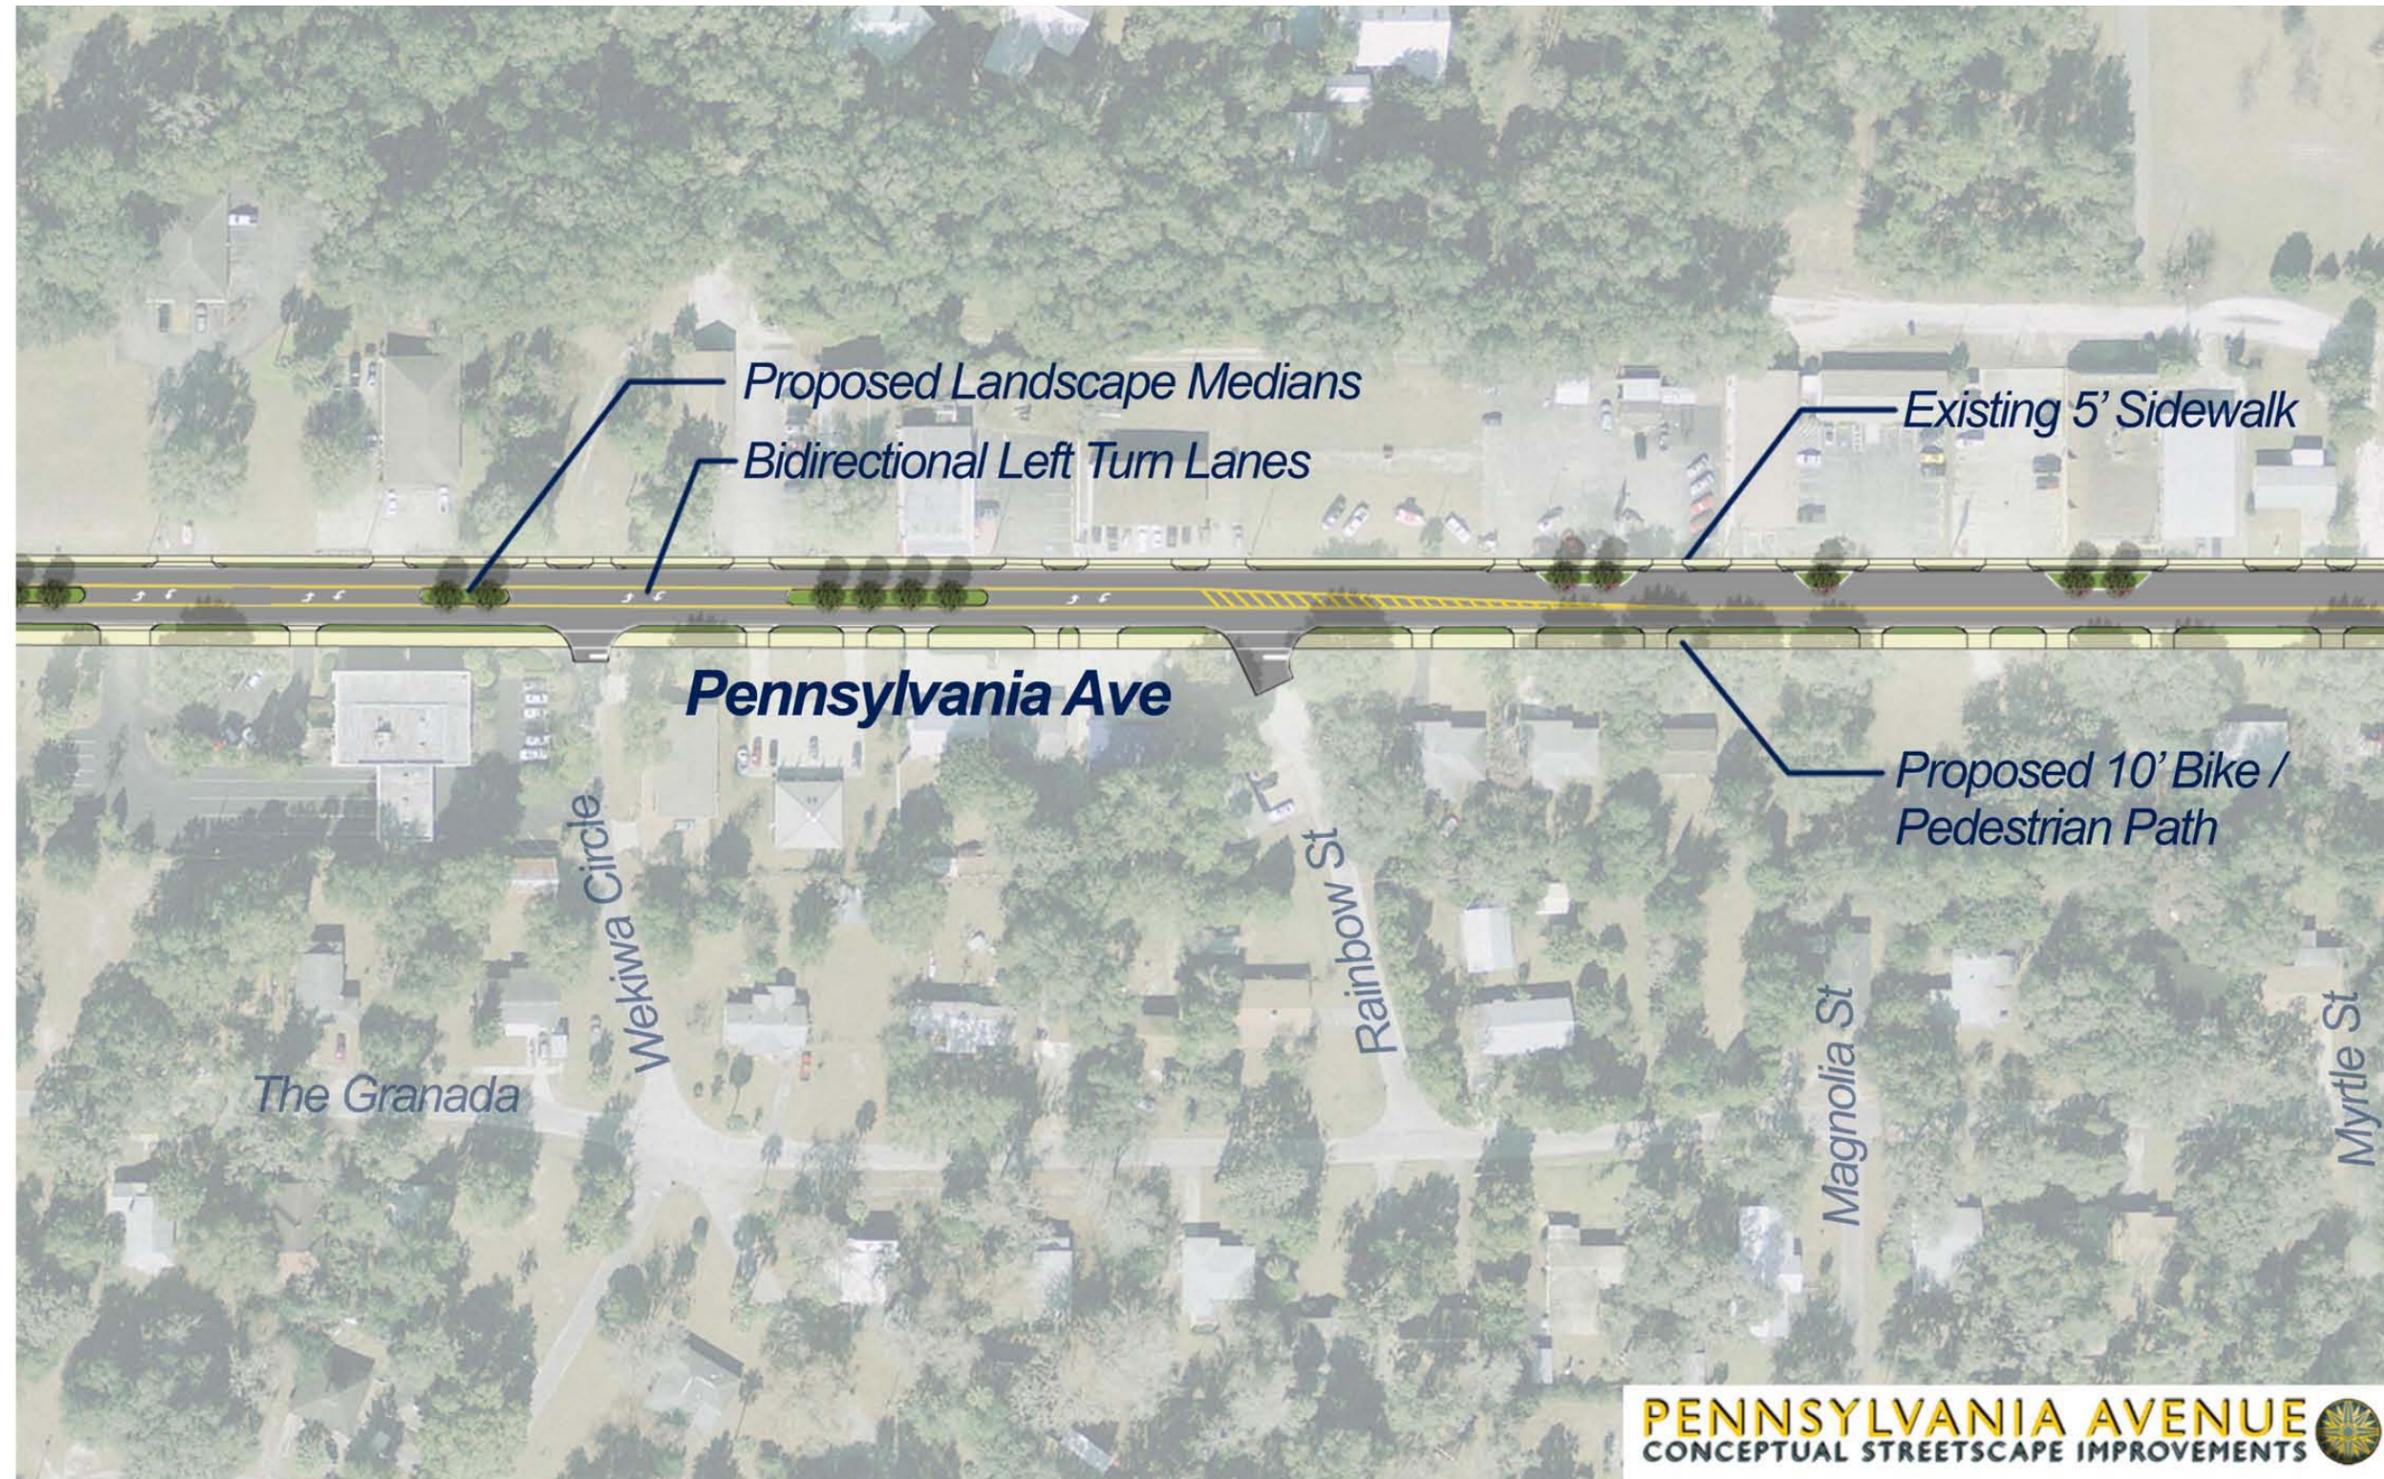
B: Pennsylvania Avenue Streetscape Plan View - West
